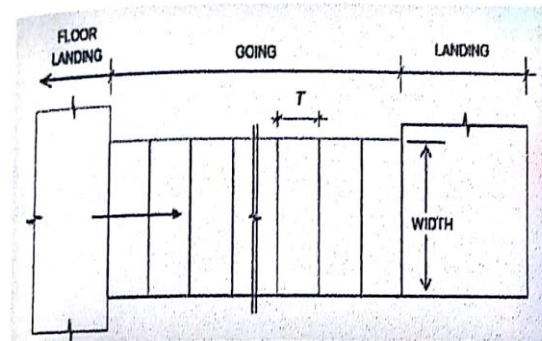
A TYPICAL FLIGHT IN A STAIRCASE (PLAN)
